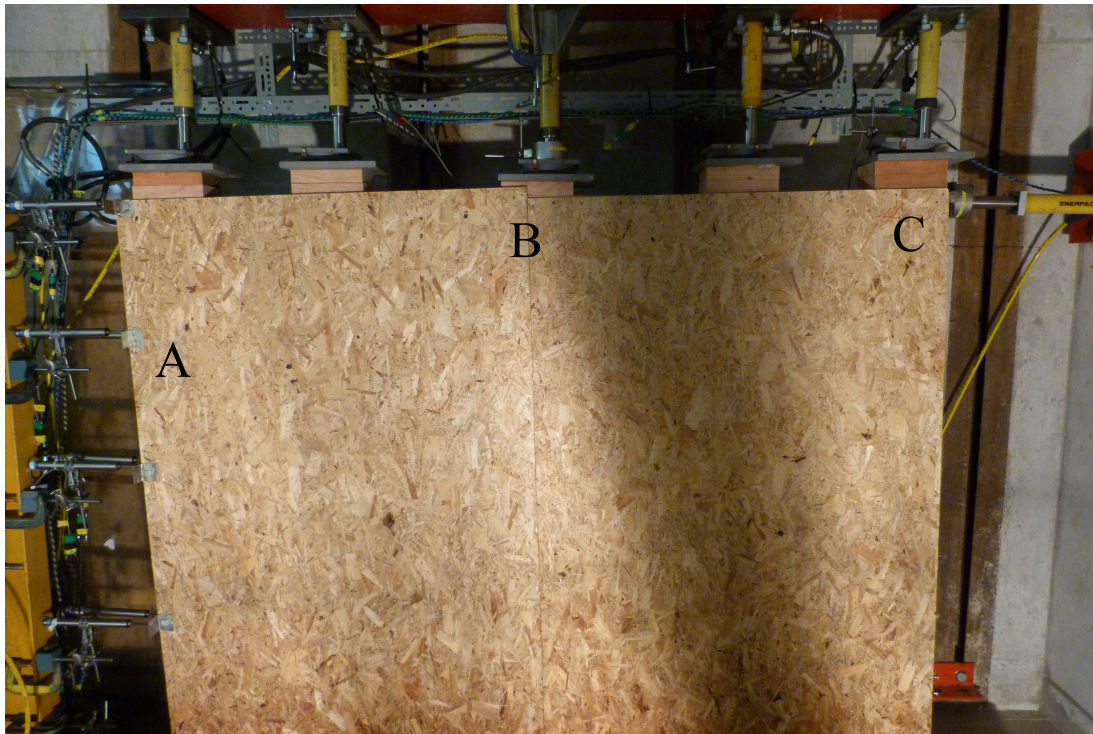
Wall during testing showing location of loading jacks and LVDT's. A) LVDT's monitoring the horizontal displacement of the OSB and timber. B) Vertical loading jacks and bridge bearings applying vertical loads of 5 kN per stud. C) Horizontal loading jack and load cell. This wall was under load when this image was captured, hence the visible displacement.
